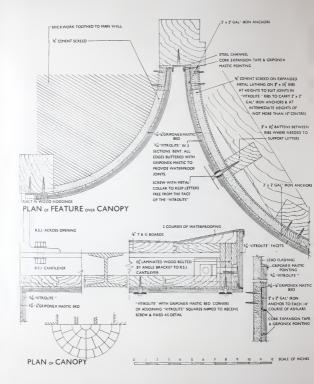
DETAIL SECTION THROUGH FRONTAGE OF BUILDING
